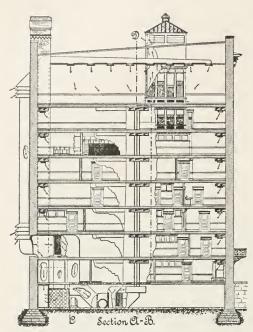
Chicago Telephone Company. Plan of ventilating plant.
